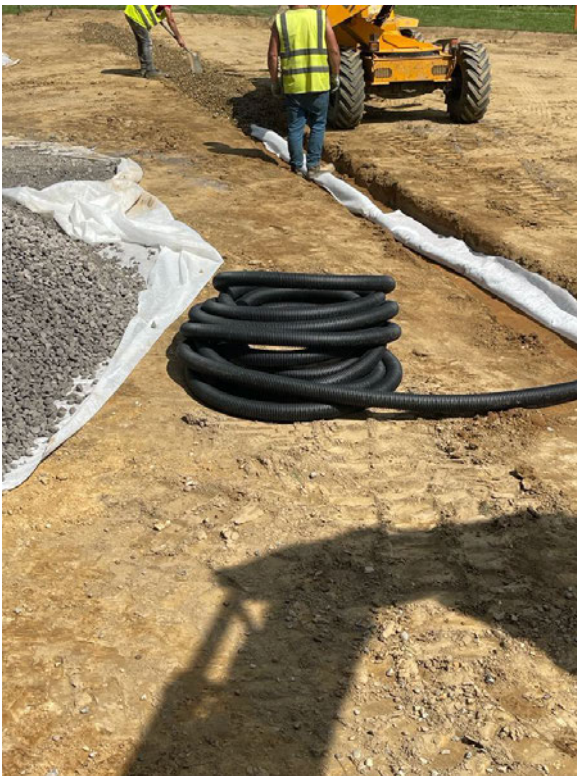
Pitch drainage and MOT Type 3 piled above geotextile at formation (MOT Type 3 not spread)
